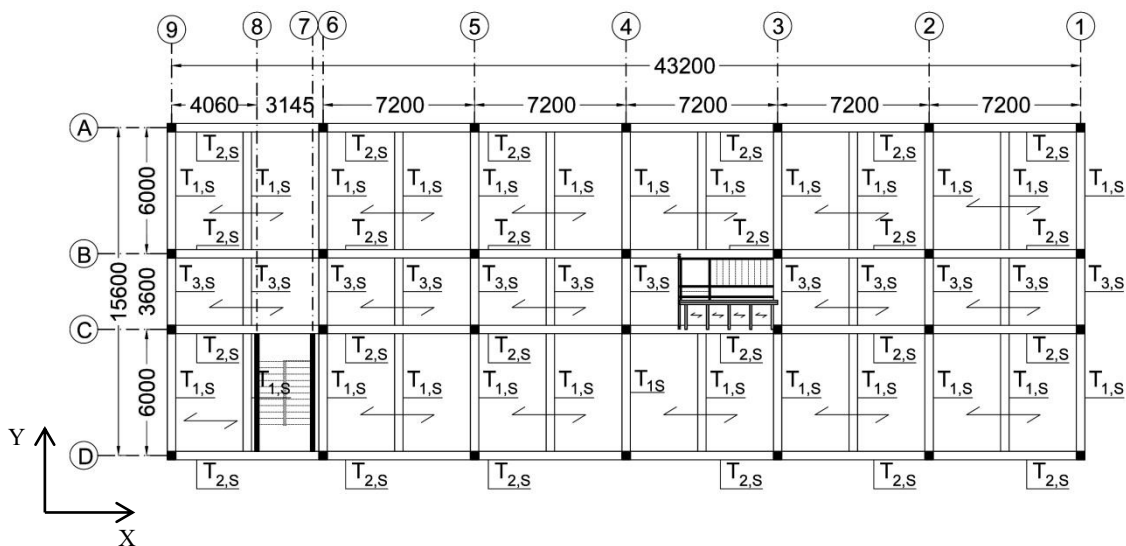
First floor plan with alphanumeric alignment identification and steel beam numbering
